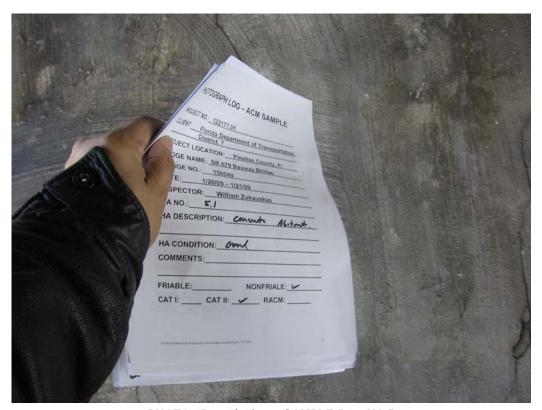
01/21/09 – SAMPLE 5.1 – HA 5 CONCRETE ABUTMENT WALLS
